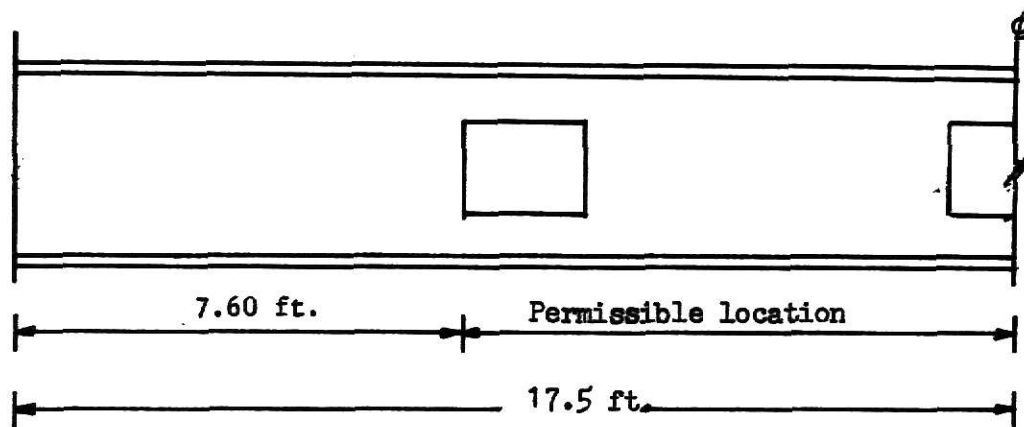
Permissible Opening Location for Floor Beam with $A_T = 0.5$ sq.in.
